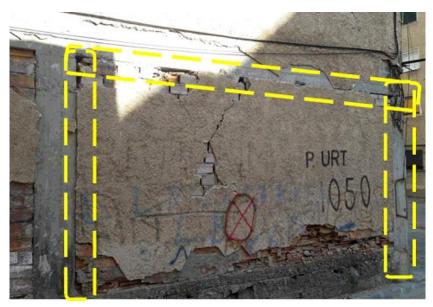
Separation of the infill from the frame, leading to the tilting of the wall in Durrës (source: Nikolić-Brzev et al., 2020).
